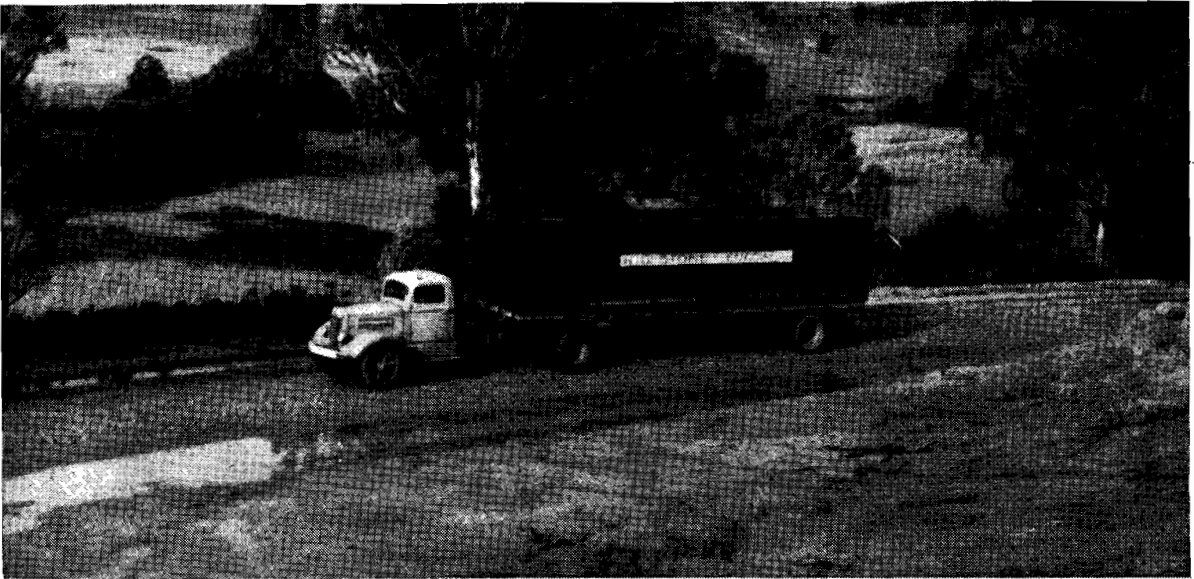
Cattle transport on section of Longwood-Ruffy Road, reconstructed and sealed.
